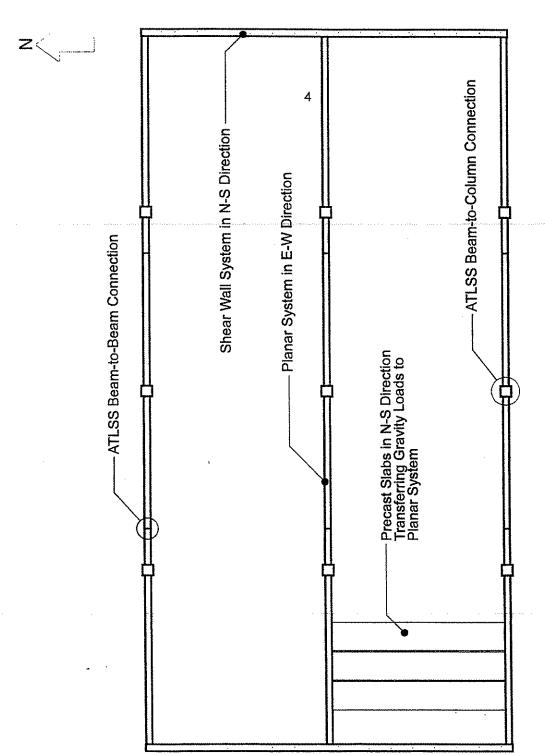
Typical Floor Plan of a Structure Using Two Dimensional APC System
